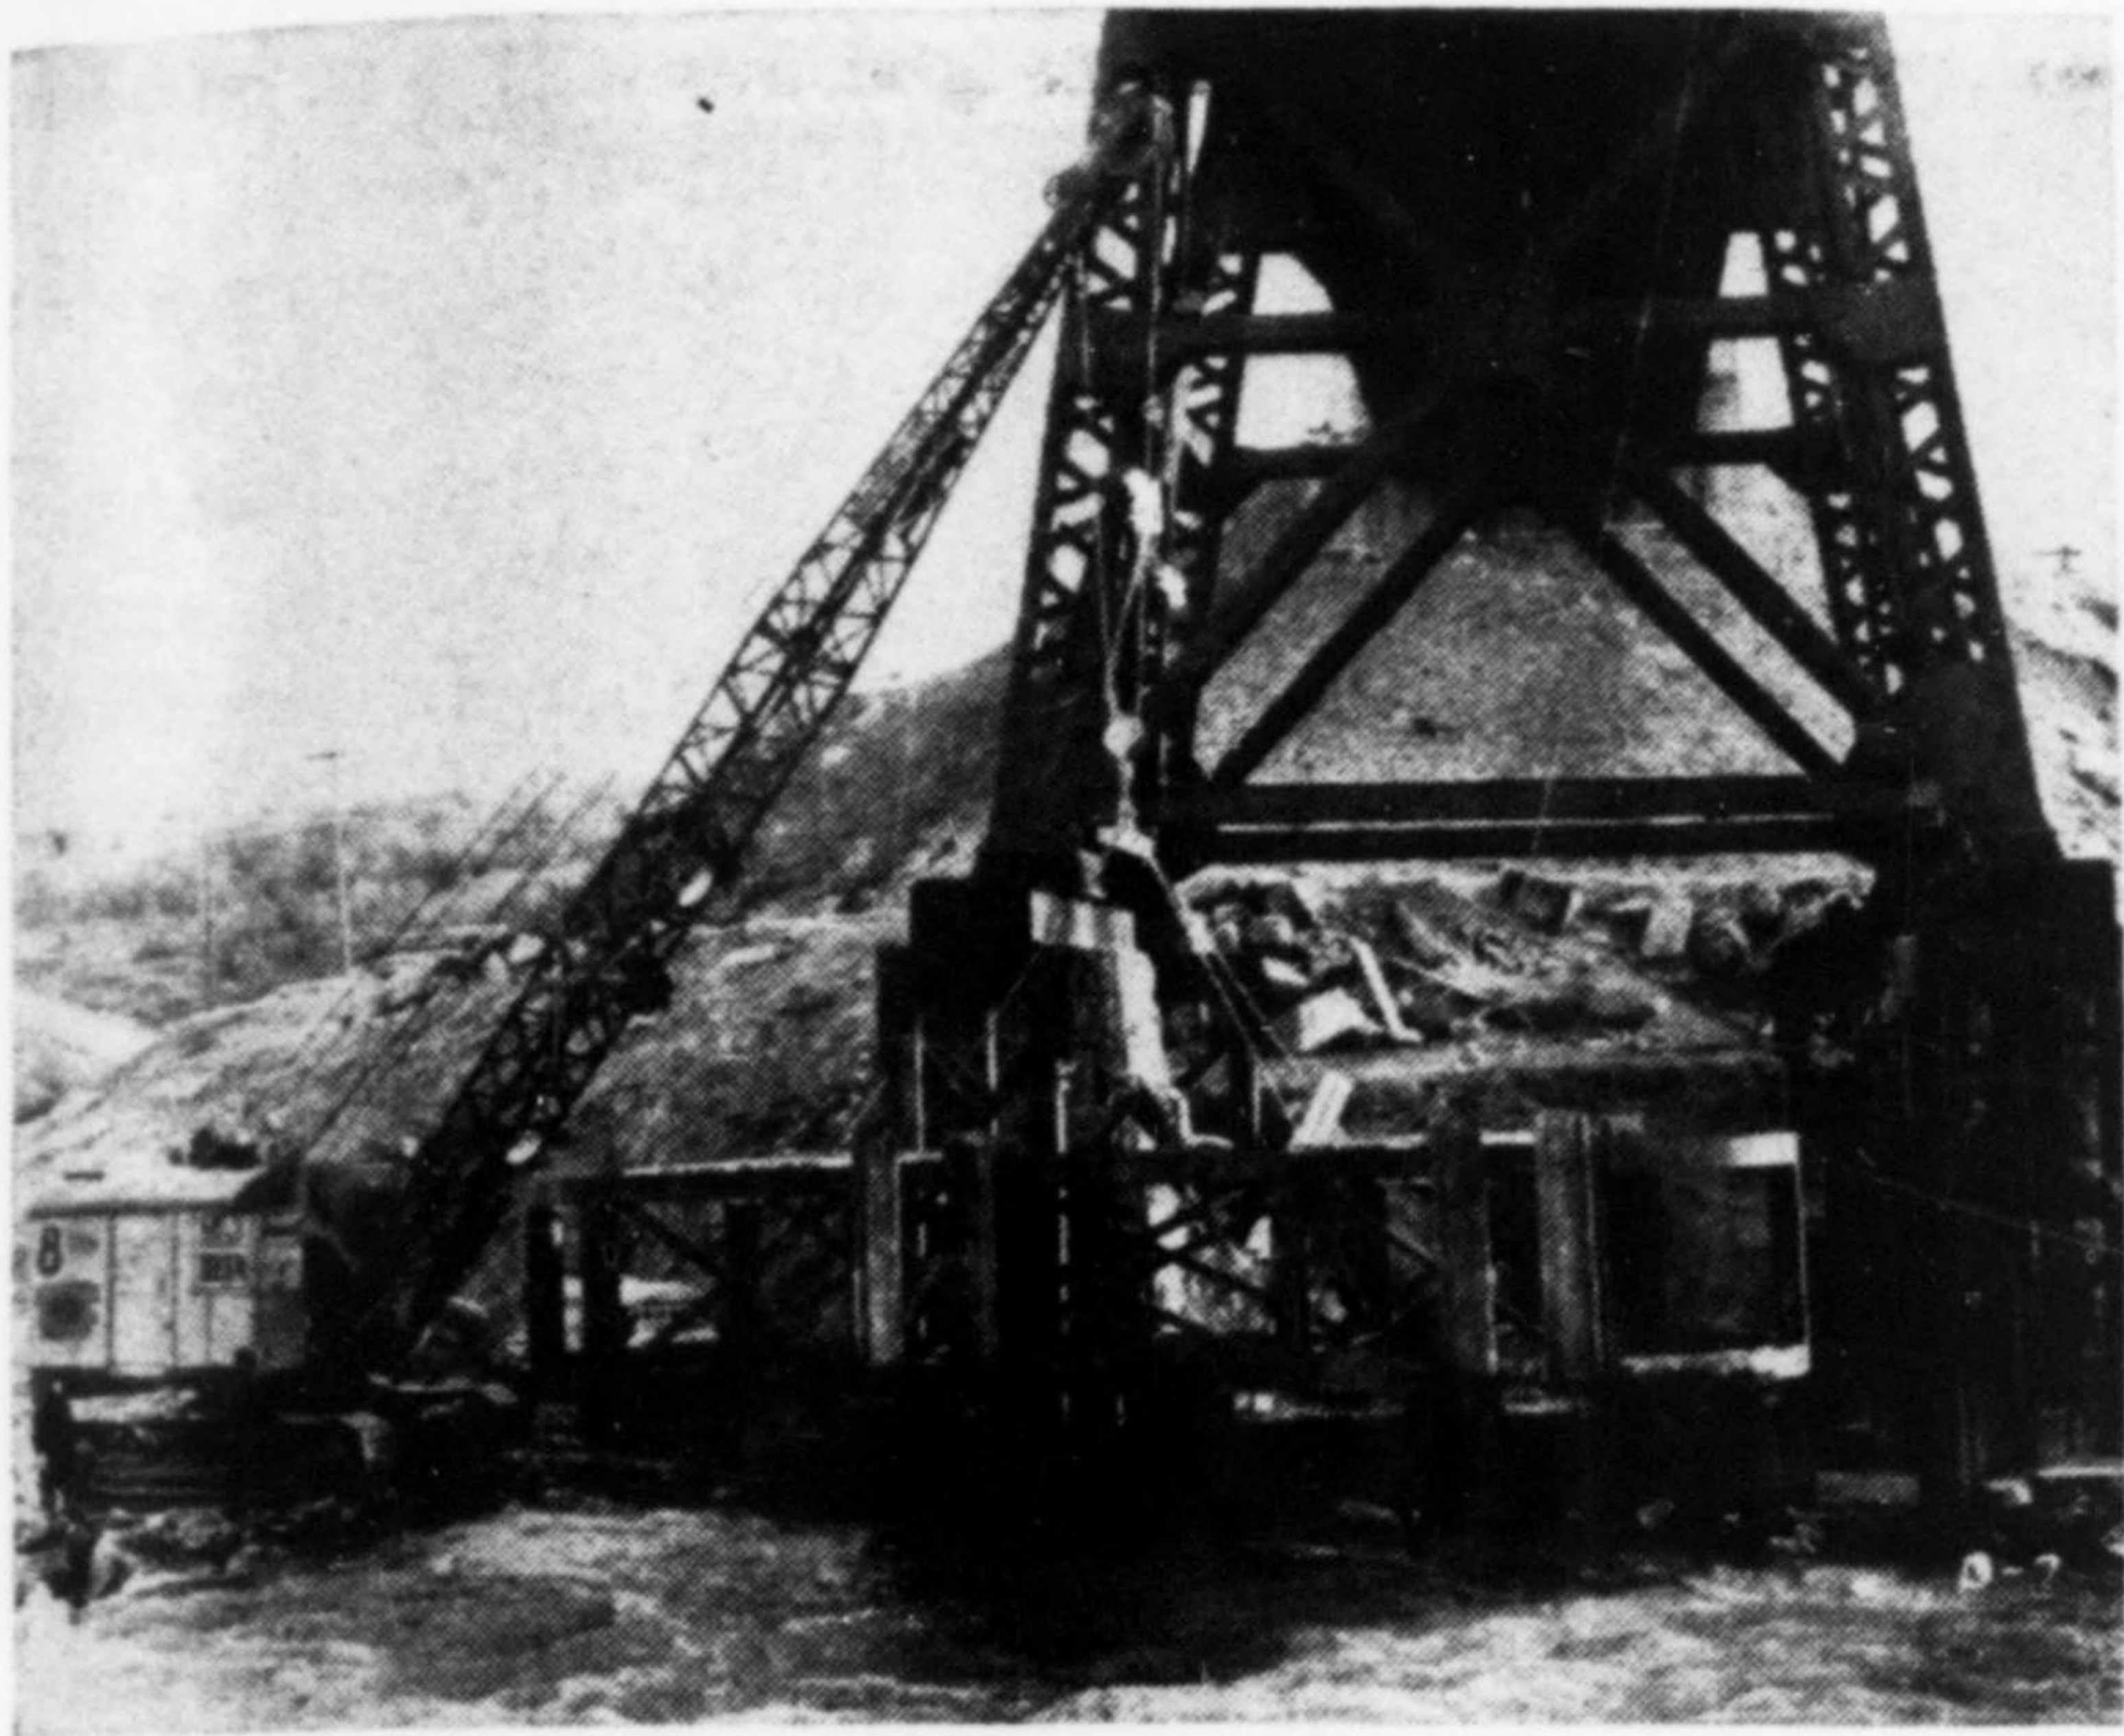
A cofferdam in swift water was built around a structural frame supported from the existing bridge. Long sheet-piles were started through the interlocks of the short pieces.
